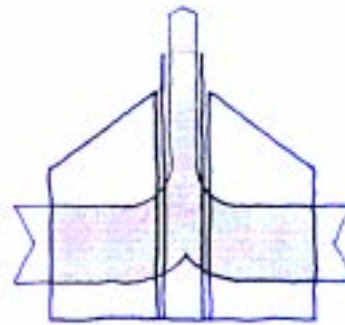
The chimney used as spatial element: chimney placed centrally in the house's plan with outlet above the roof's ridge.
